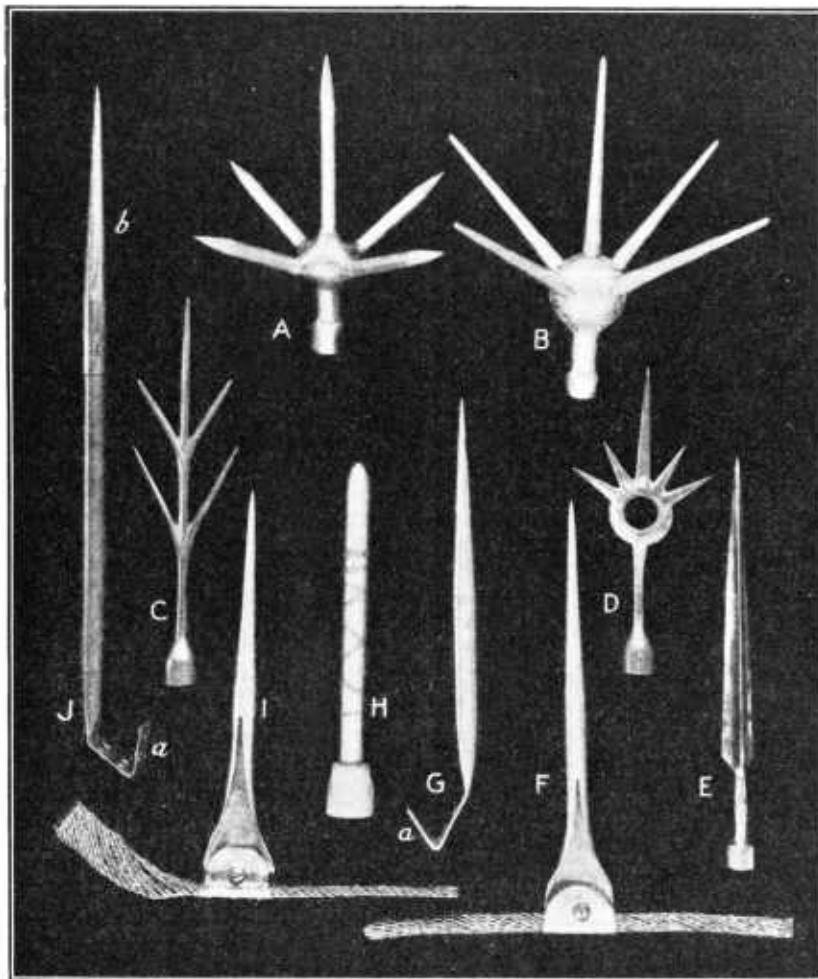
Air terminals and points. A, B, C, and D are multiple points used with tubular or star-section elevation rods. E, solid copper-bayonet point for attachment to tubular or star-section elevation rods. F and I, short air terminals of tubing, the lower end of tube opened up and fastened to round or flat cables. G and J, short air terminals for attachment to flat cables, part *a* being bent around the cable and both fastened to roof by nails or screws. H, point for iron pipe air terminal. (See fig. 5, B.) Part *b* of air terminal J, called a shell point, is very frequently used with tubular air terminals of all heights. (See figs. 4 and 8 and fig. 9, F.)
